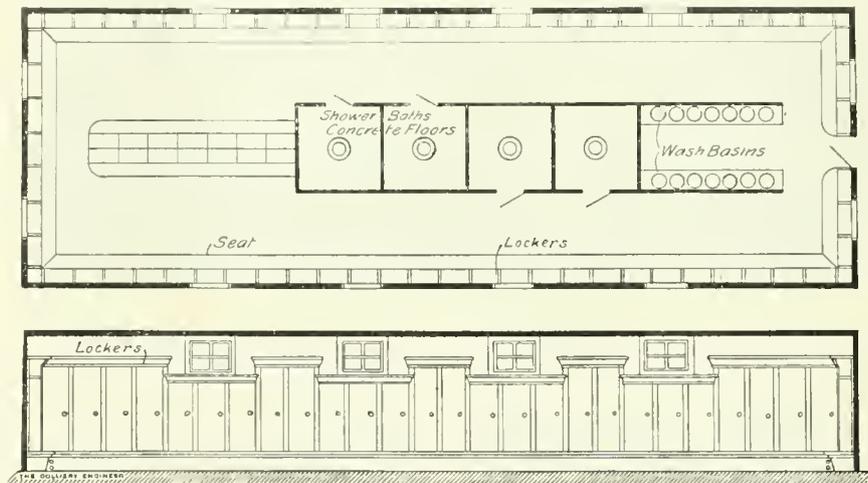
PLAN AND ELEVATION OF BATH HOUSE
